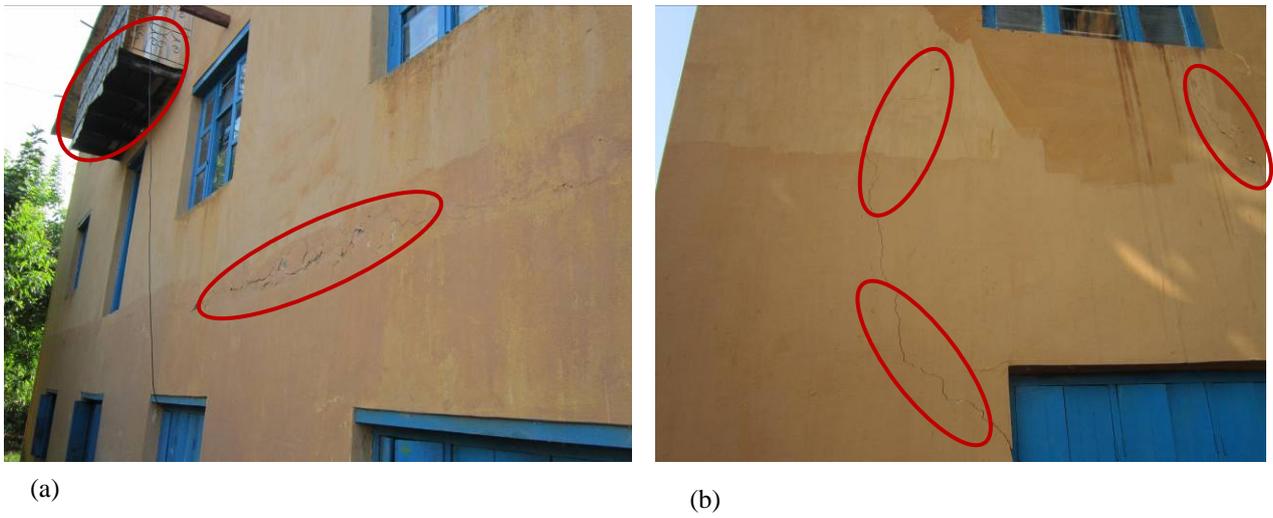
Damage to a 25-years old building with RC as well as timber frame: (a) cantilever part in the verge of failure and crack at the floor level and (b) cracks extending between two windows of consecutive floors. The length of the building is 22 m and the width is 14 m.
